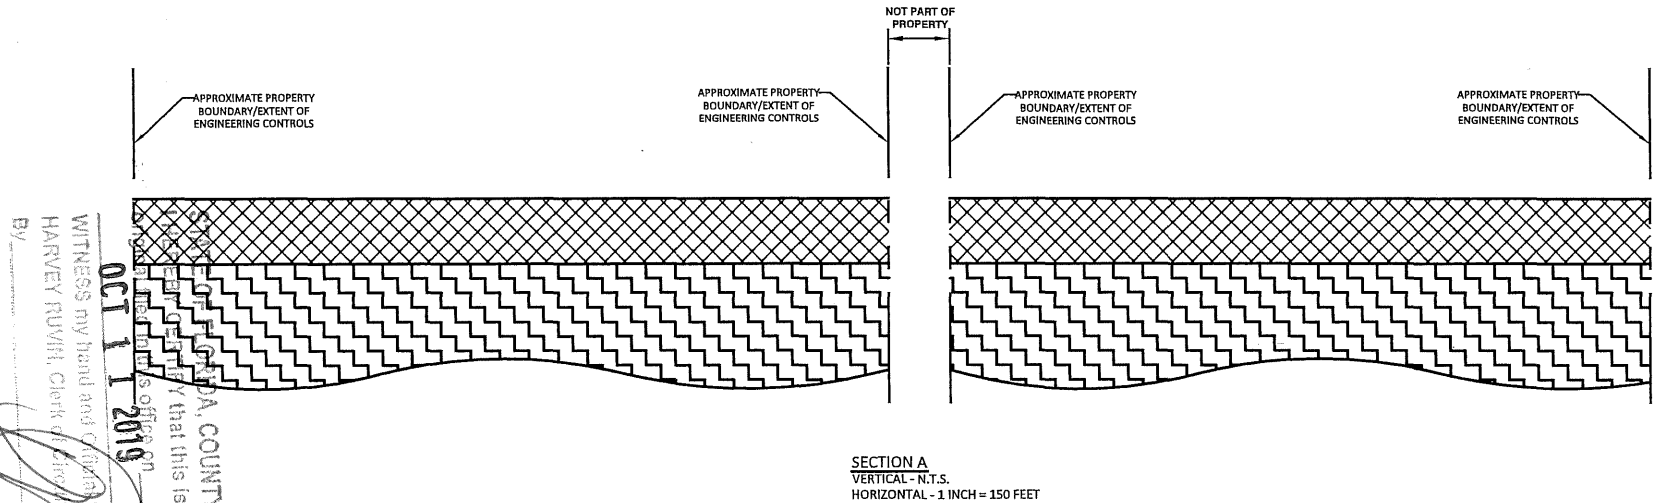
EXHIBIT C, FIGURE 1. ENGINEERING CONTROL PLAN
